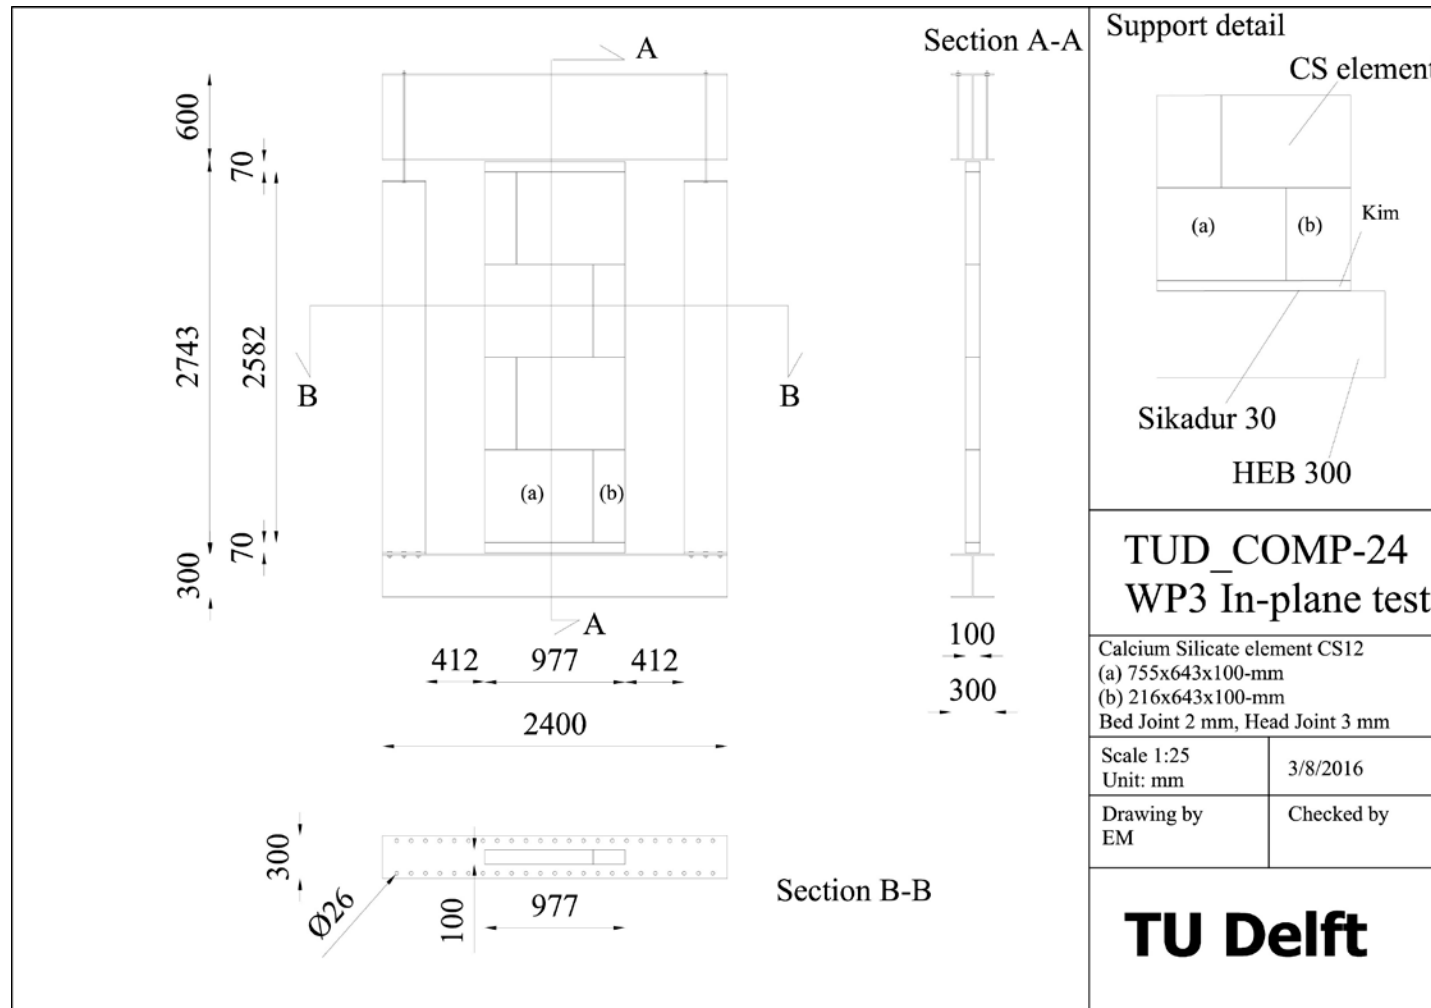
Drawing adopted for the construction of wall TUD_COMP-24. As built dimension in Table 19.
